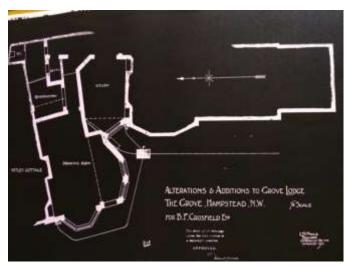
Drawing of 1913 showing ground floor alterations to the Drawing Room and Study in the northern wing.
